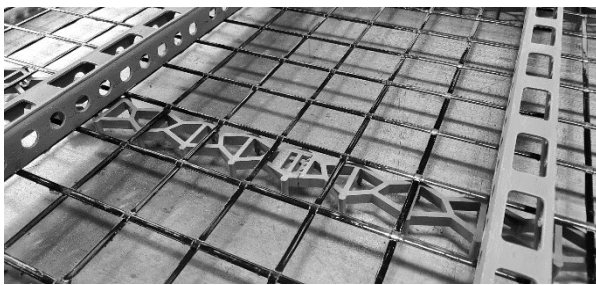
Reinforcement grid with plastic spacers and base made of fiber-reinforced concrete
